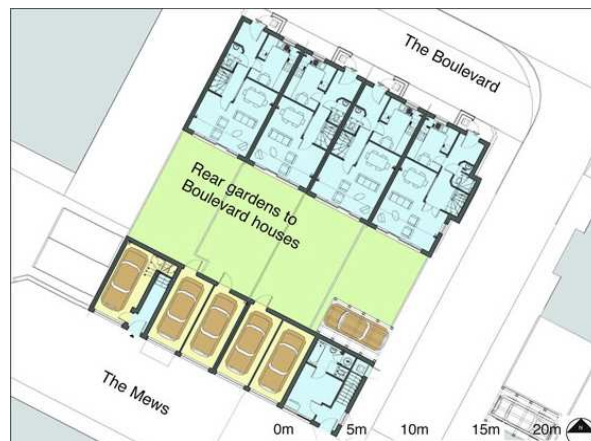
Floor Plans of Boulevard Houses at Park Central Zone 1.
